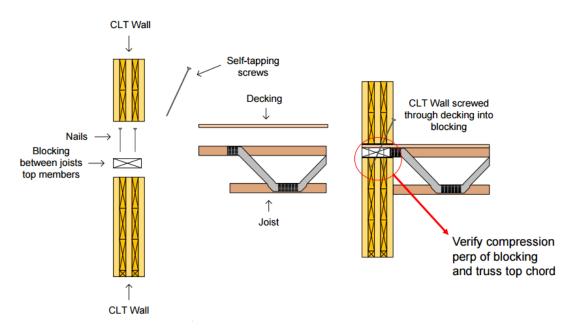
CLT wall and metal plated floor truss. (Adapted from Mohammad 2011)
